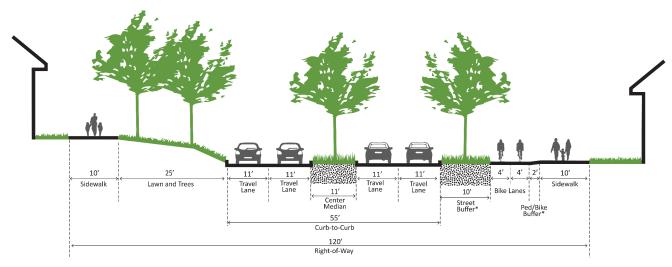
Georgia Avenue (M-8): Blair Mill Road to Eastern Avenue, Looking North
